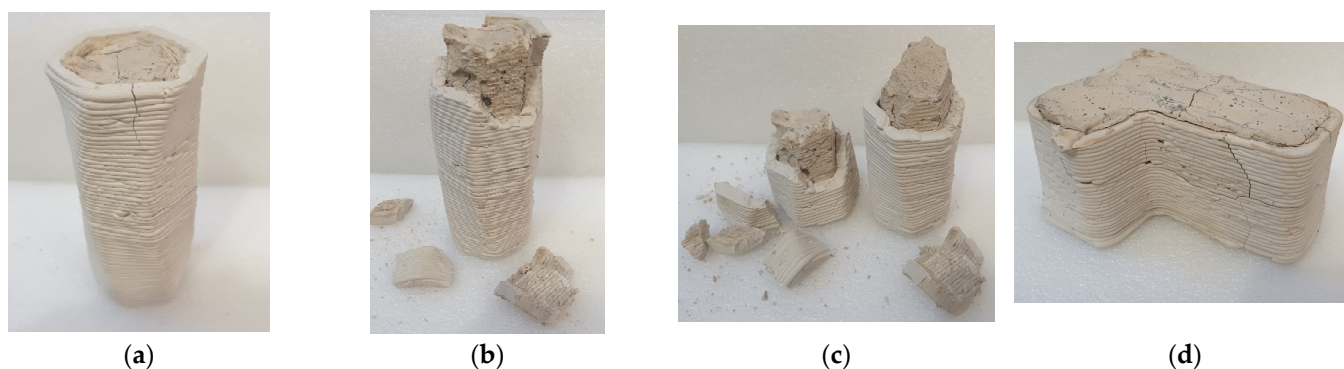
3D-printed formworks filled with cement: (a) Turning hexagon extrusion filled with cement. (b) Stripping (c) Stripping (d) L shape part filled with cement.
